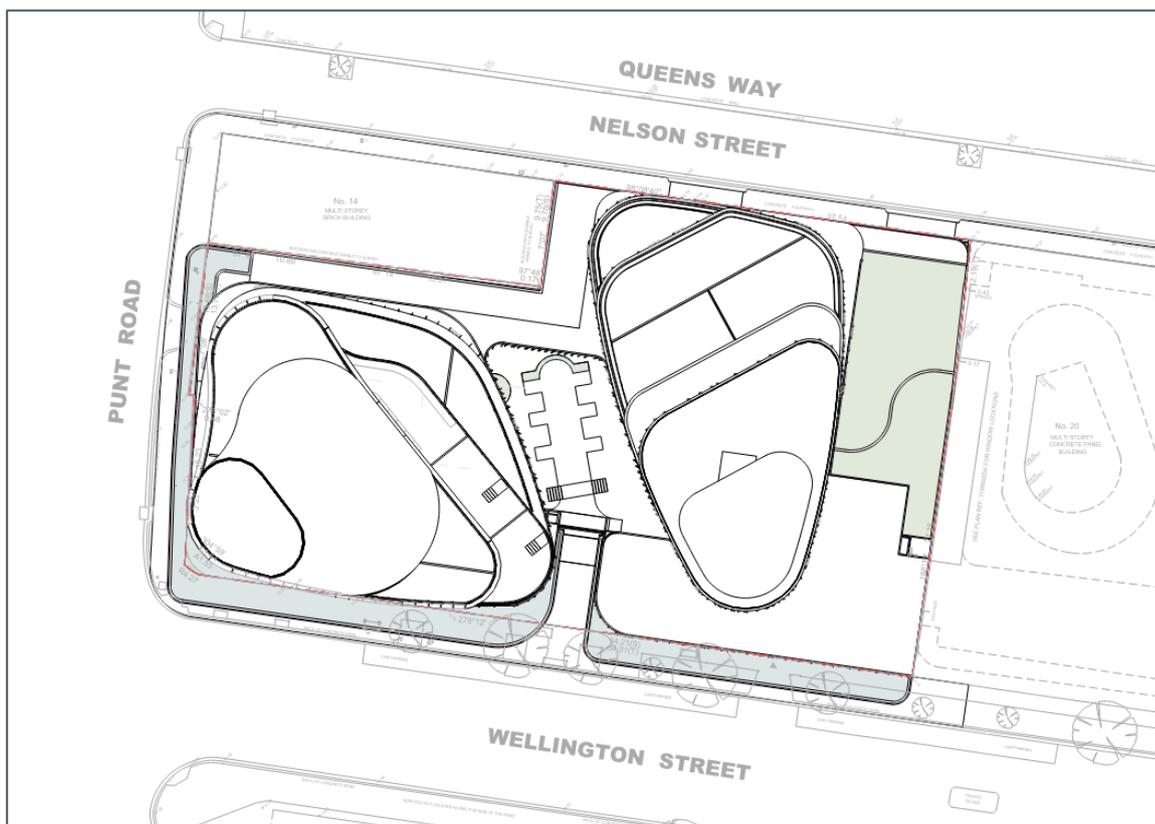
Site location of the proposed development 8-12 Punt Road & 3-7 Wellington Street
